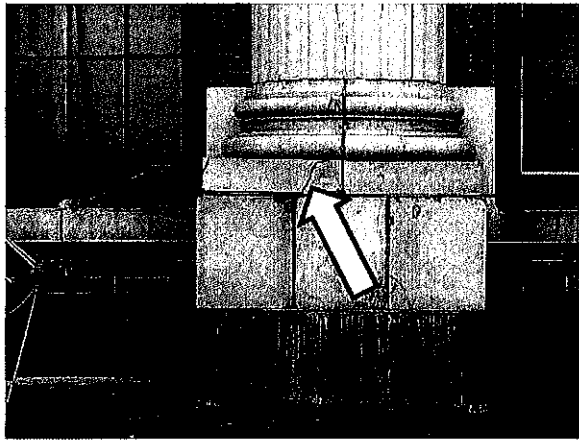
Cracked stone at the base of the pillar on the South elevation
